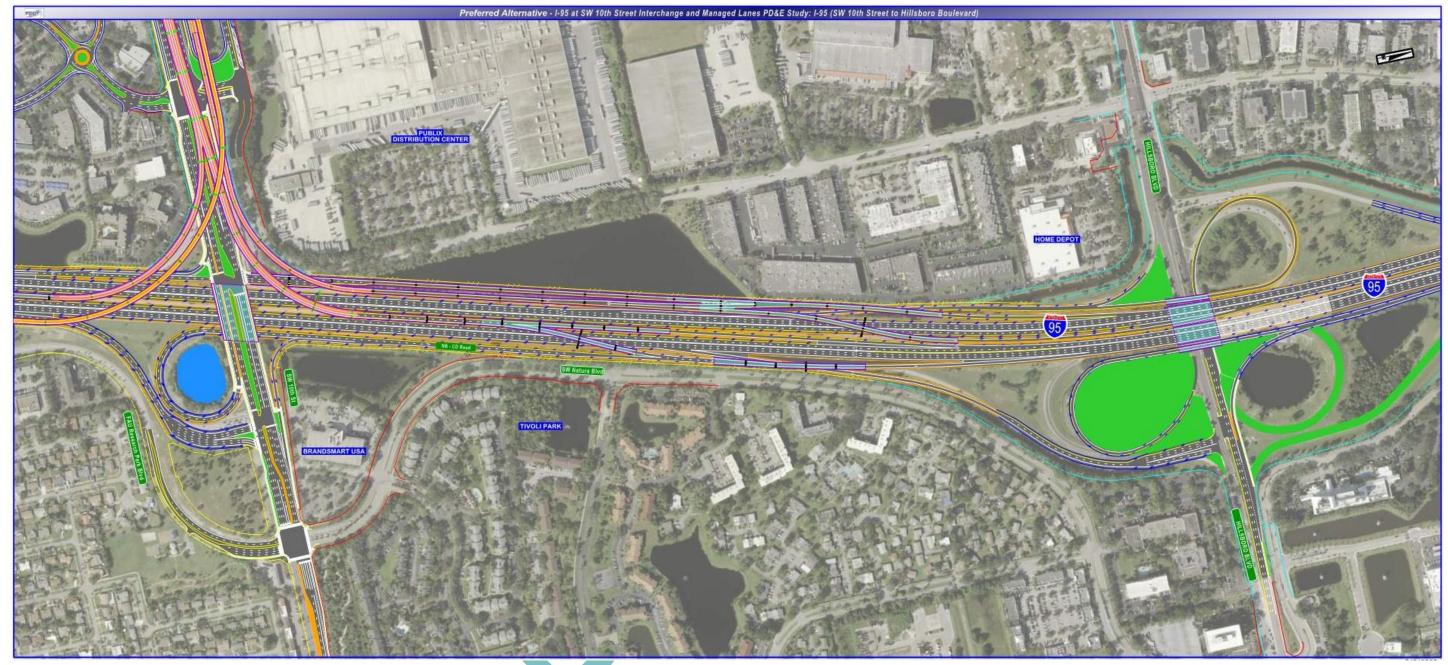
3: I-95 - Preferred Alternative Concept Plan (North of SW 10<sup>th</sup> Street)
